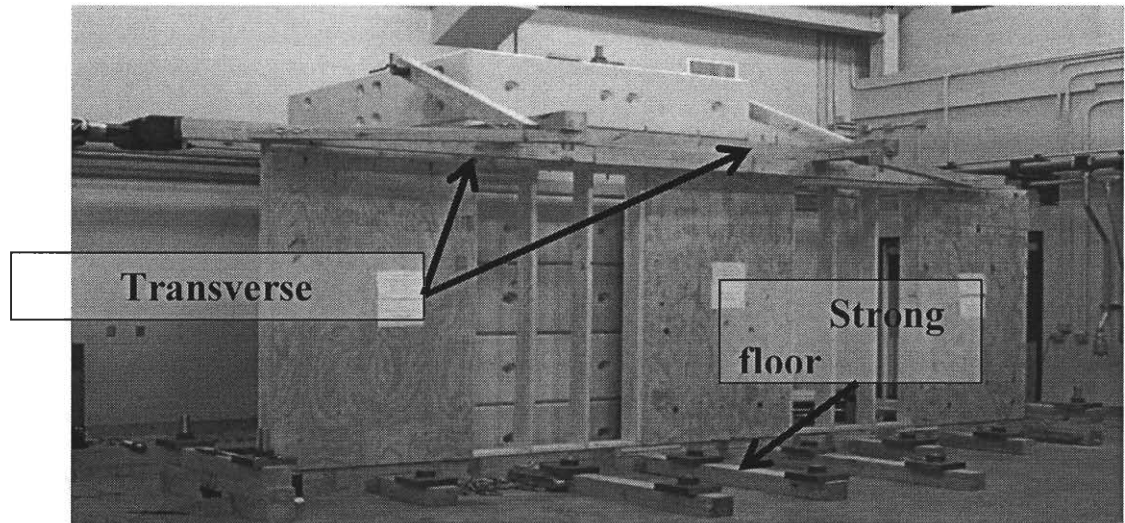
'Dummy' Wood Shear Wall Specimen
